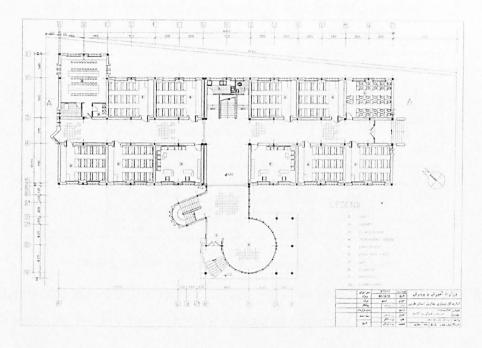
Ground floor plan of Jahan-Ara School, courtesy of Iranian Education Department
